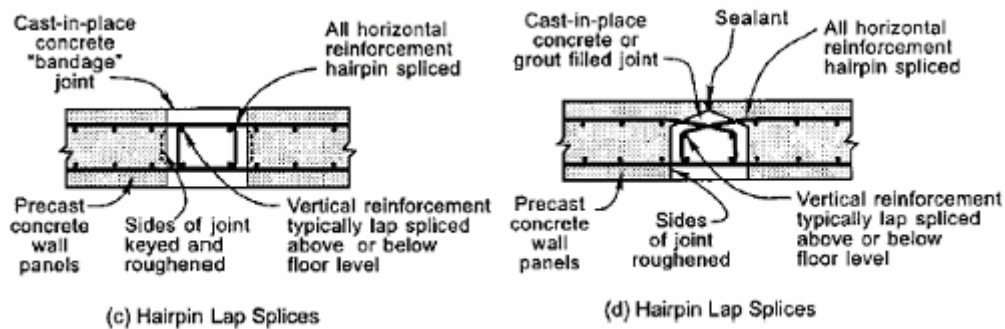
Vertical joints for equivalent monolithic precast reinforced concrete structural wall construction type b and c. [12]
